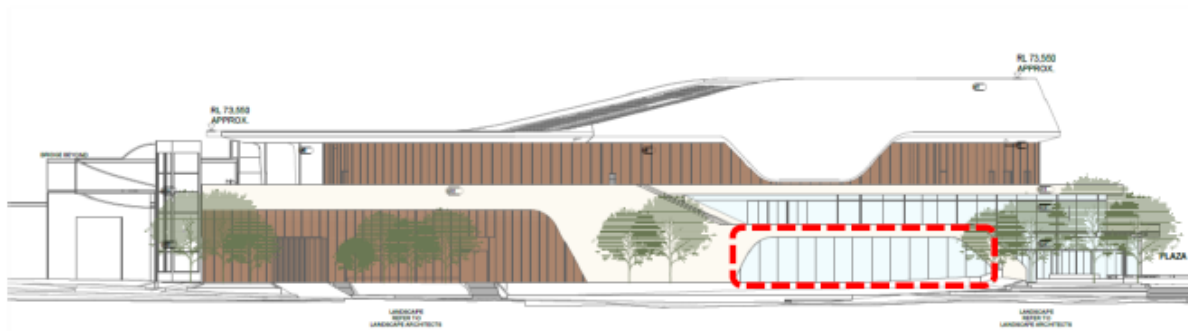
Amended elevation of the community building fronting Blaxland Road. Additional glazing on the façade (as shown in red dashed line)
